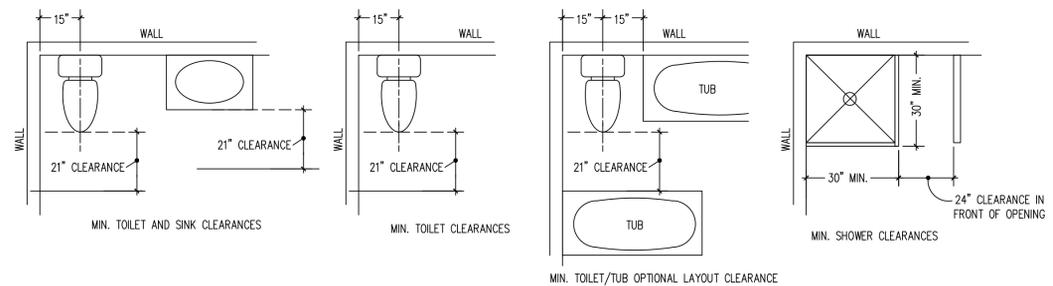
MINIMUM FIXTURE CLEARANCES
